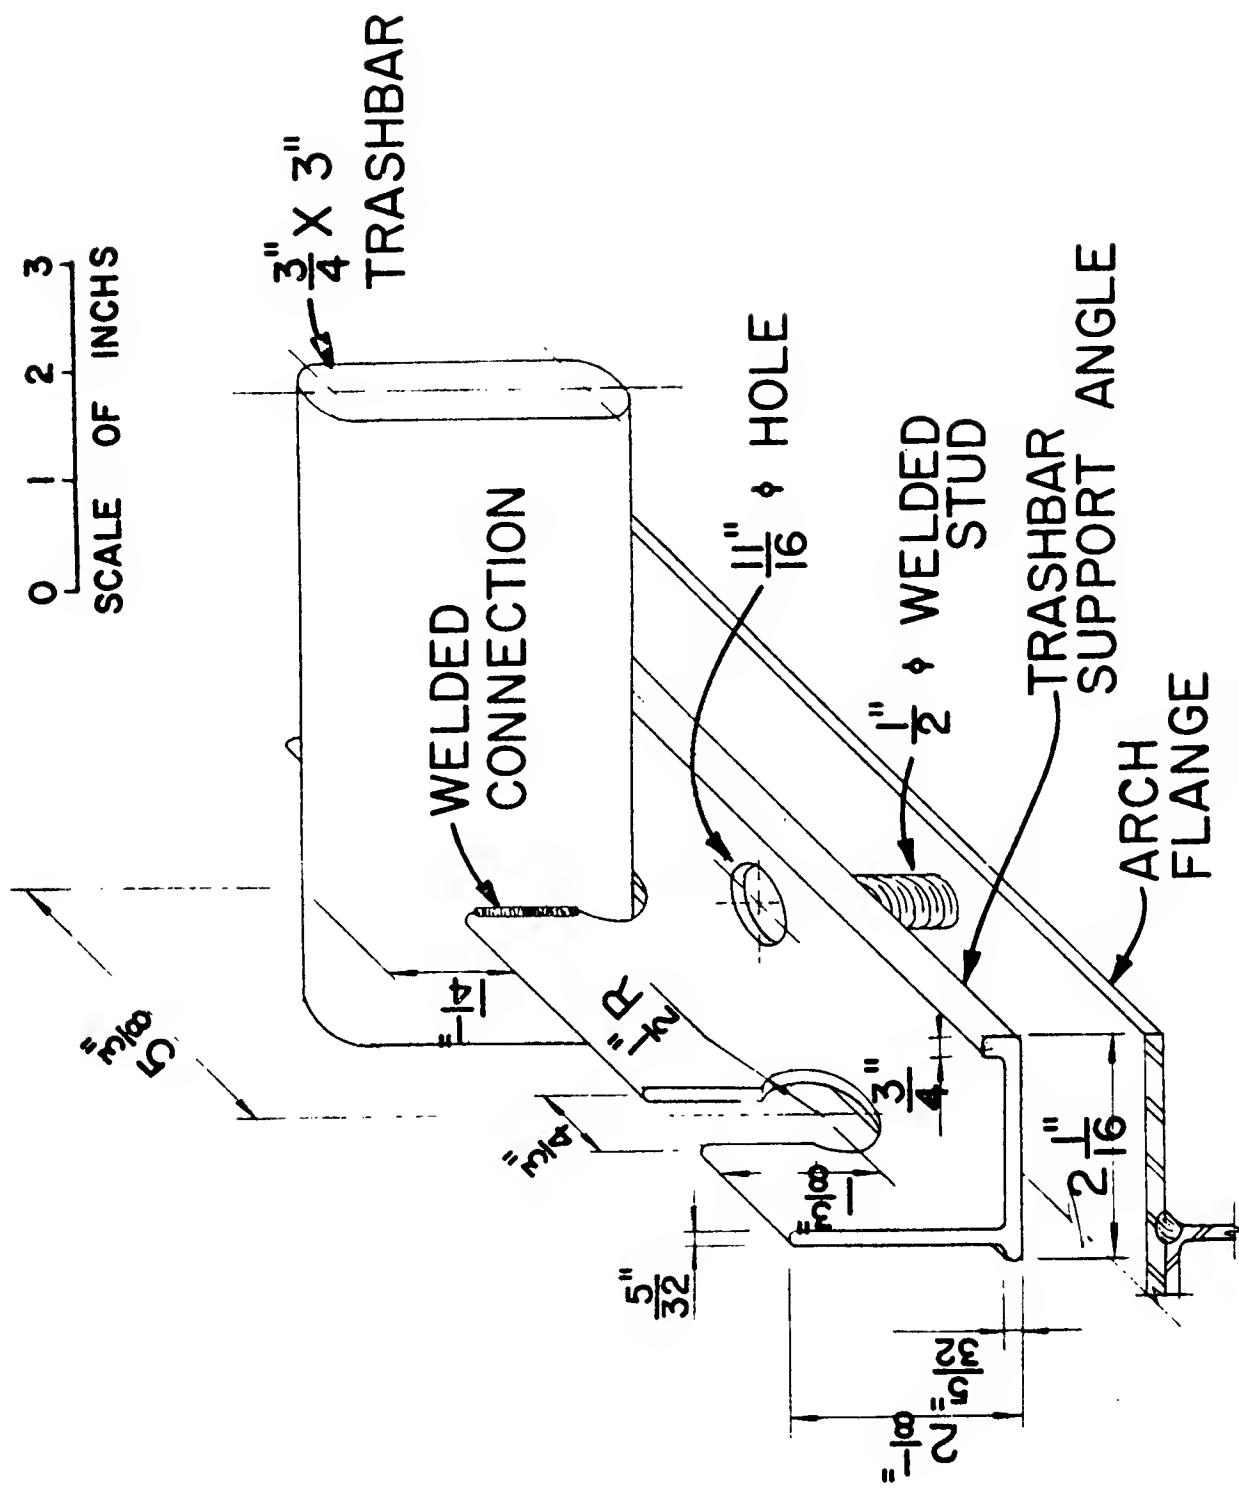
(Drawing) Trashbar Support Angle and Trashrack Connection
